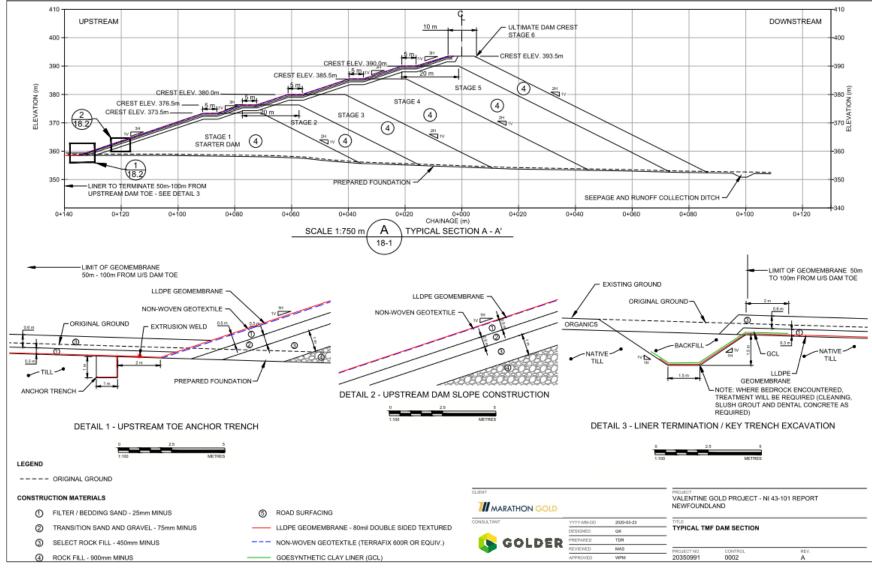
Tailings Management Facility - Typical Dam Section & Details
